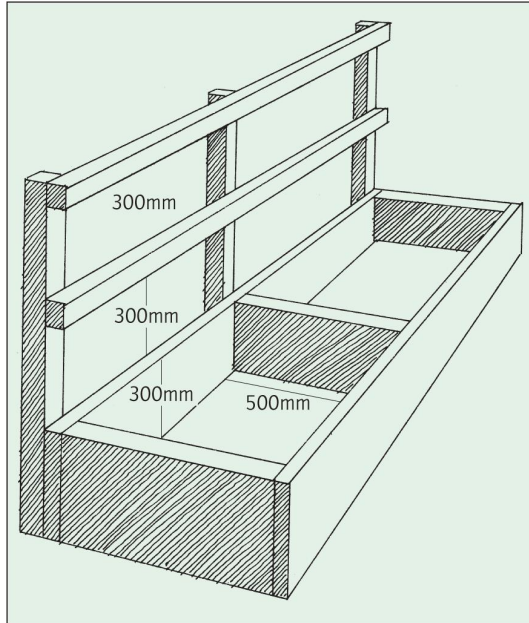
Wooden feed barrier. Uprights and rails are 50mm × 50mm timber and the planking is 25mm thick. Small breeds may need a slightly lower trough. The trough is not essential because sheep can feed through the barrier and direct from the floor the other side. (Not to scale.)
